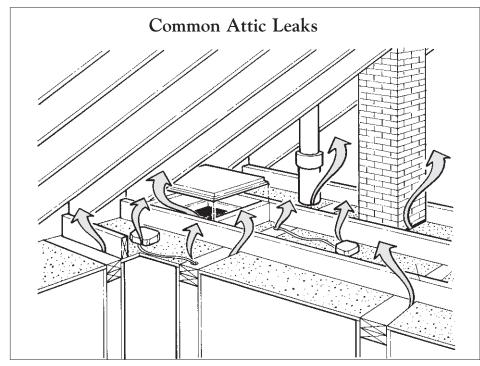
A typical ceiling has many penetrations that are hard to seal. Roof vents are designed to remove the moisture leaking into the attic through such cracks.
